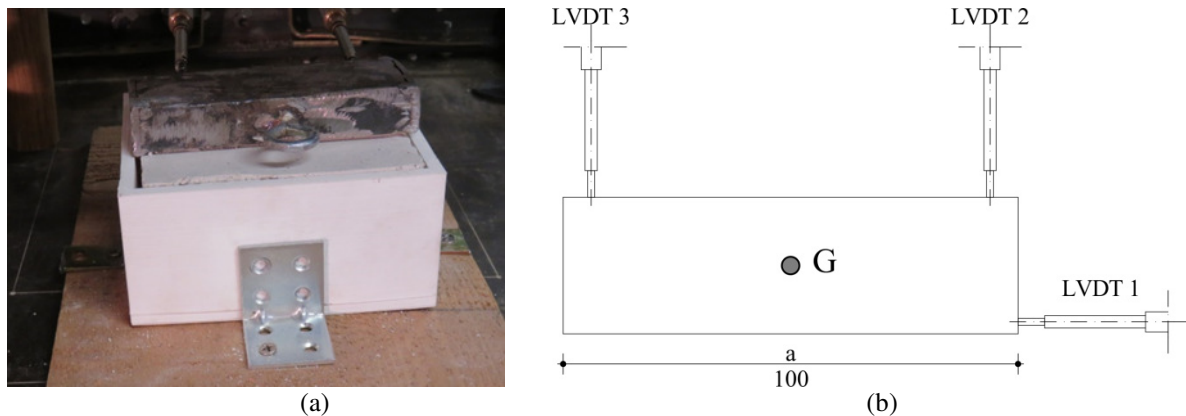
(a) Interlocking block with steel cup; (b) LVDT's position in the plan view
